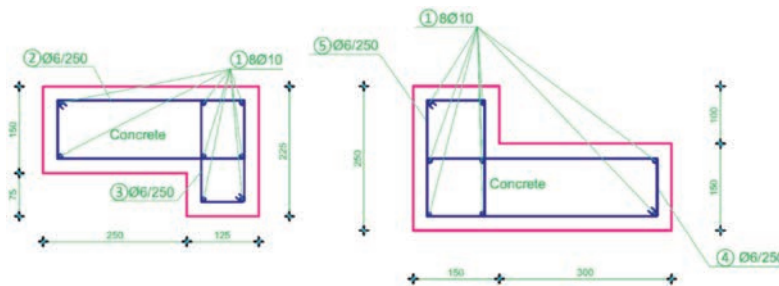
Detail of cast-in-situ concrete capping pad and concrete foundation pad (all dimensions in mm).
